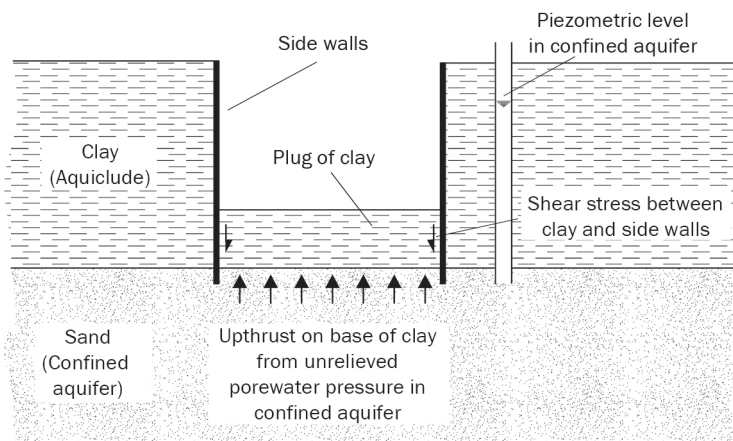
Base failure: excavation in a low permeability soil overlying a confined aquifer
